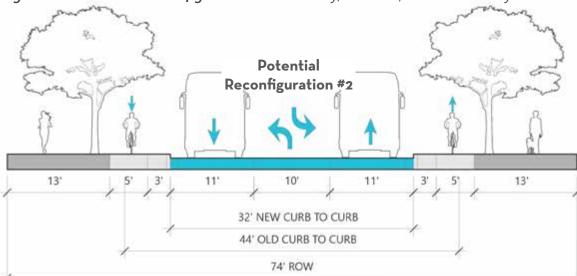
Potential Reconfiguration #2: One-Way, Sidewalk-Level, Class IV Bikeway on a Downtown Collector Street.
